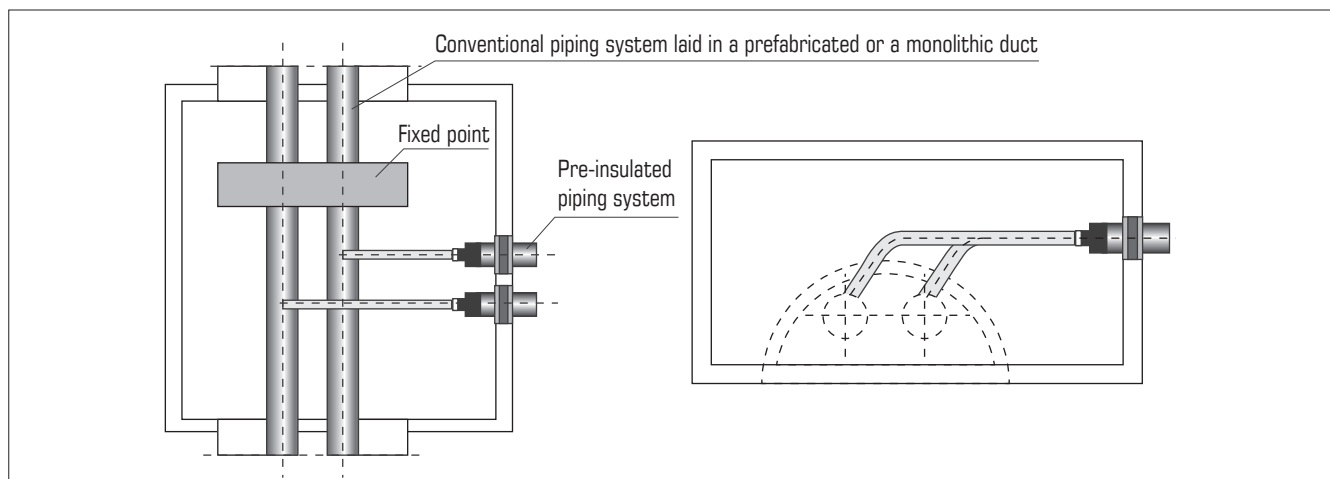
Constructing a branch pipe from a pre-insulated piping system towards a conventional piping system
